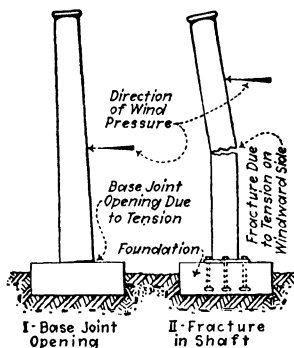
Chimney joints opening on windward side due to wind pressure.
